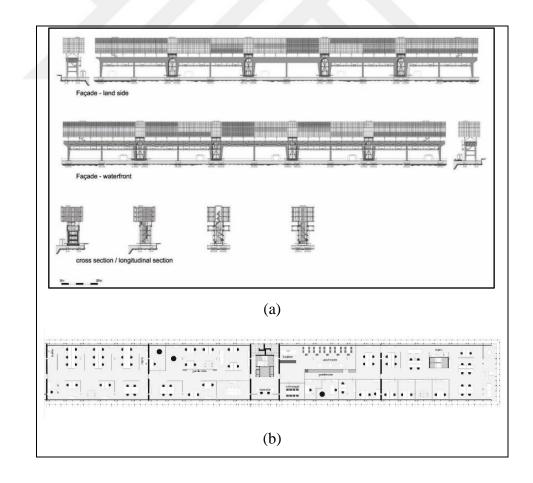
(a) Elevations and sections of the Kraanspoor, Office plan of the Kraanspoor [61], [62].
